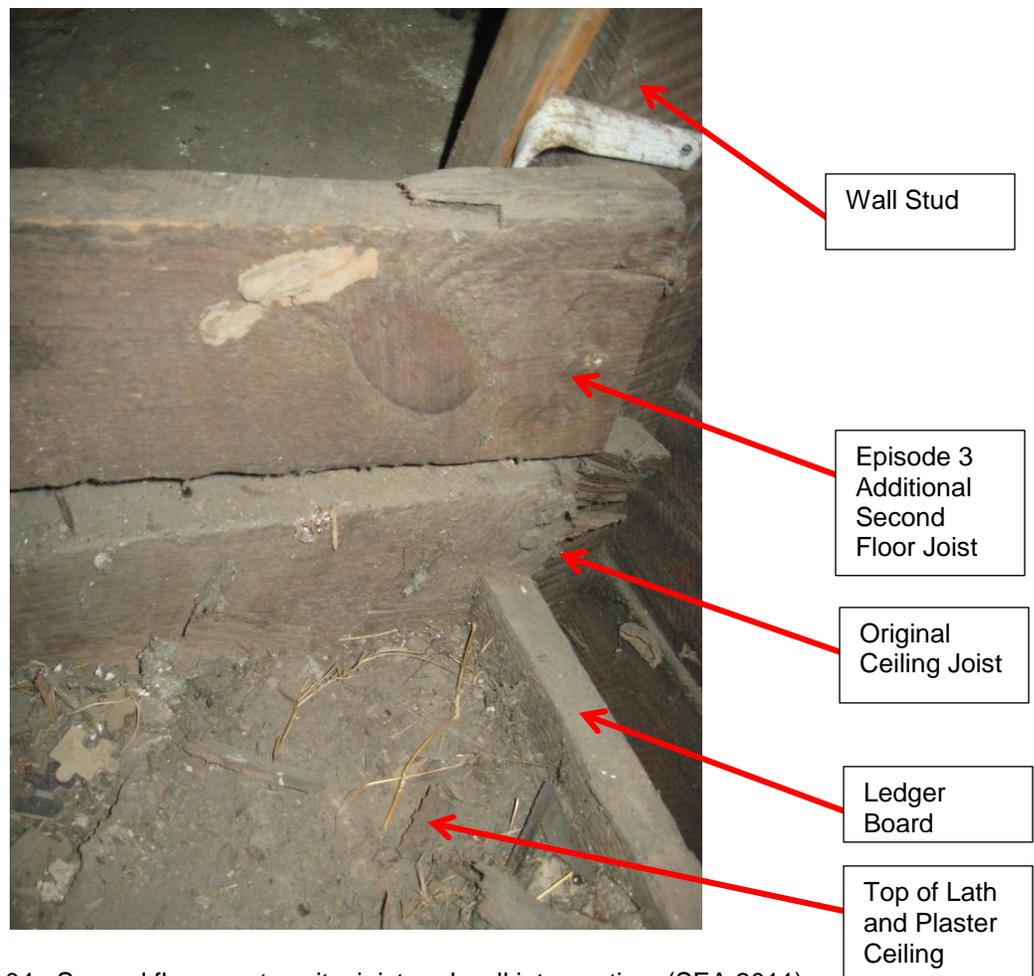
Second floor west cavity, joist and wall intersection. (SEA 2011)
